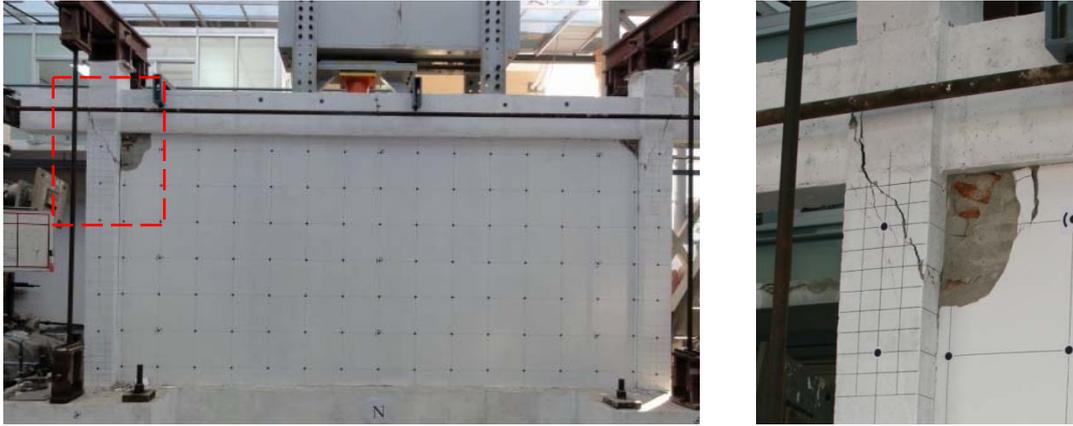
Un-reinforced masonry infilled non-ductile (MIRCFO1) with column shear failure and infill panel corner crushing at 0.50% drift
